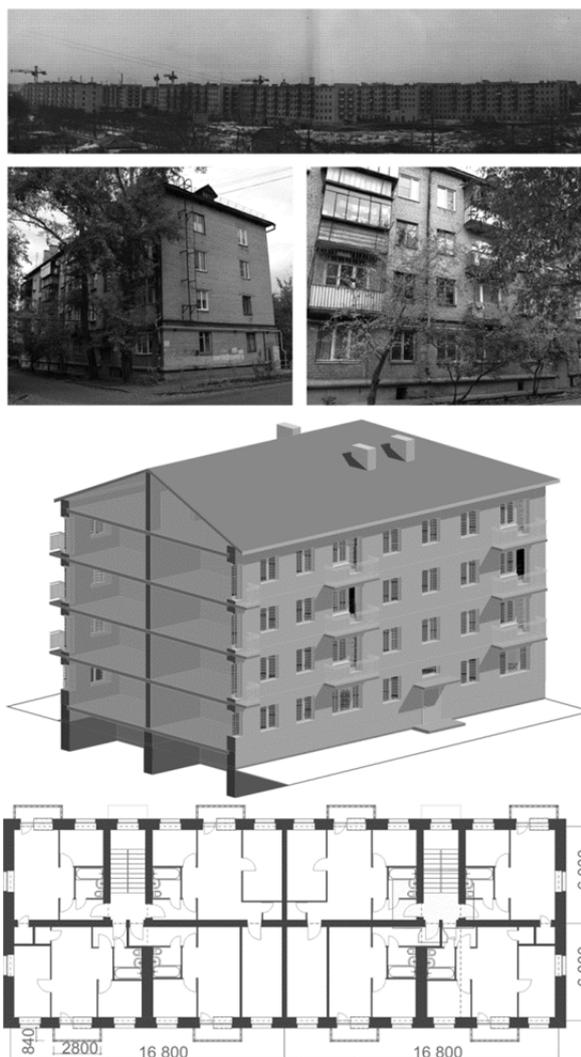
Standard-type apartment blocks in 1960s and today, Chelyabinsk. SB model: axonometric section, residential floors plan.
